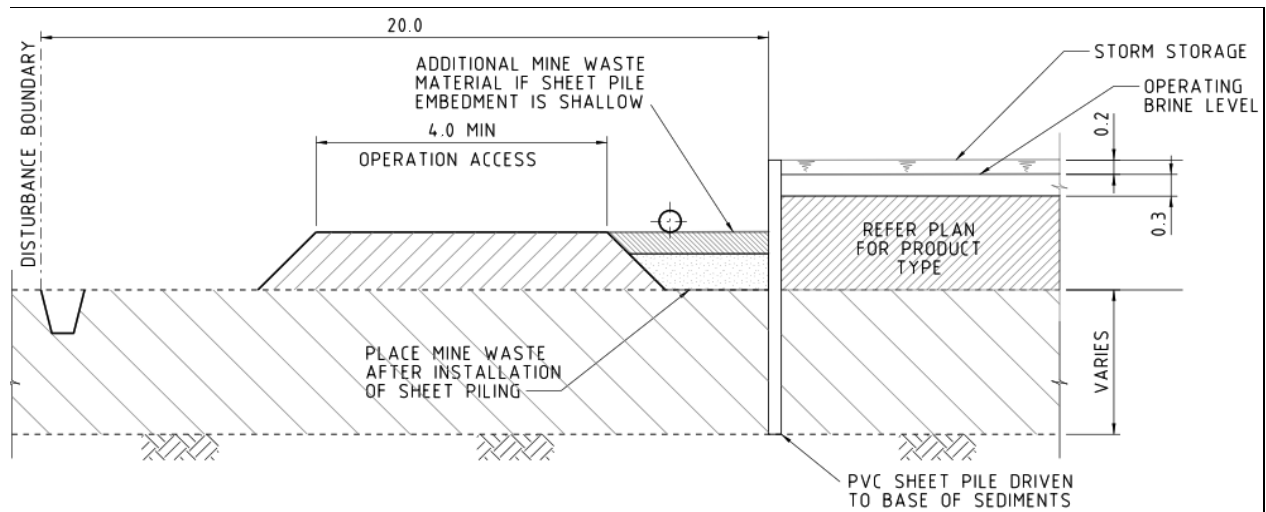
Cross-section of pond embankment – plastic sheet pile construction
